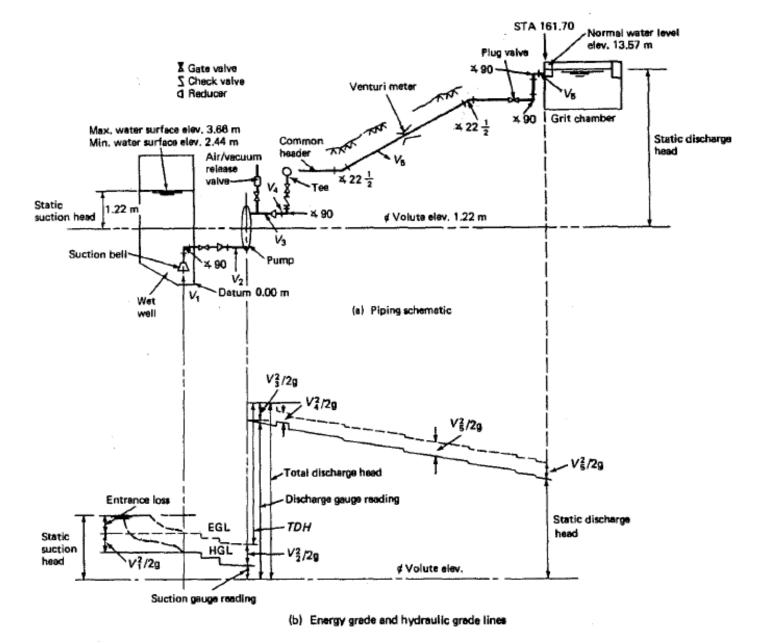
Piping Schematic Profile of Energy Grade and Hydraulic Grade Lines. All Elevations Are with Respect to Assumed Datum at the Floor Level of the Wet Well. See Figure 9-8 for STA Location.
